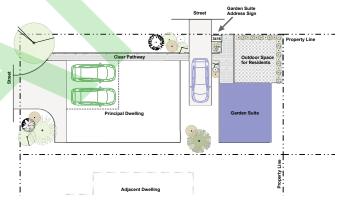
Example of a parking layout on a corner lot. The Garden Suite parking space (purple car) is accessed from the exterior side yard and the Principal Dwelling spaces are from the front yard
